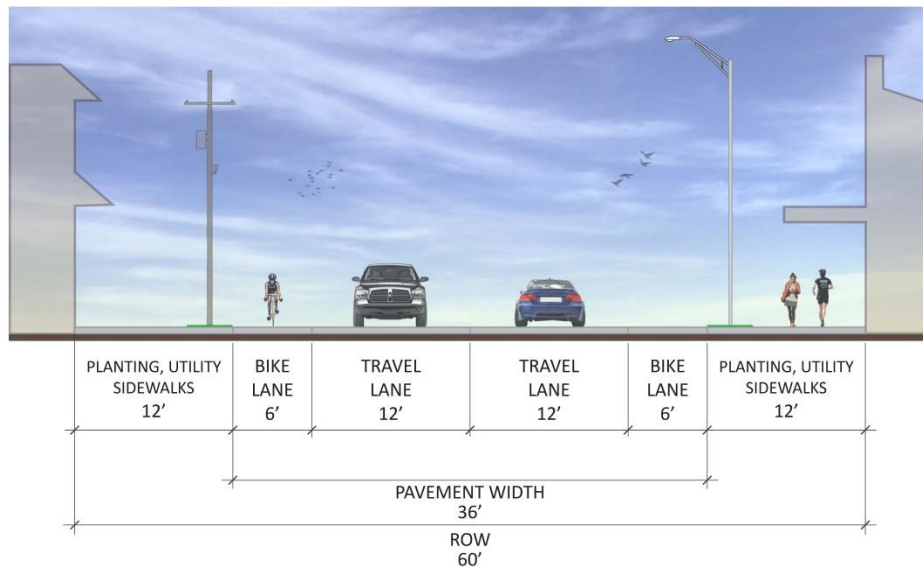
Recommended Urban Arterial Cross-Section – Option 1
